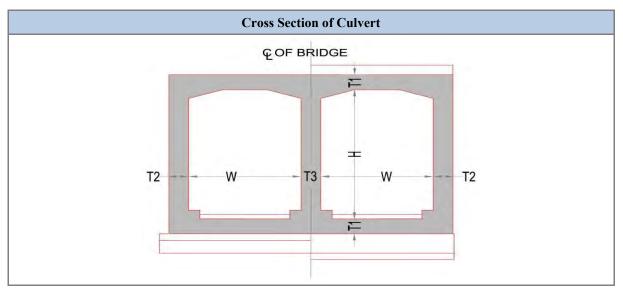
Typical Cross section of Culvert for Road and Waterway The Minimum size of box culvert is suggested as follows
